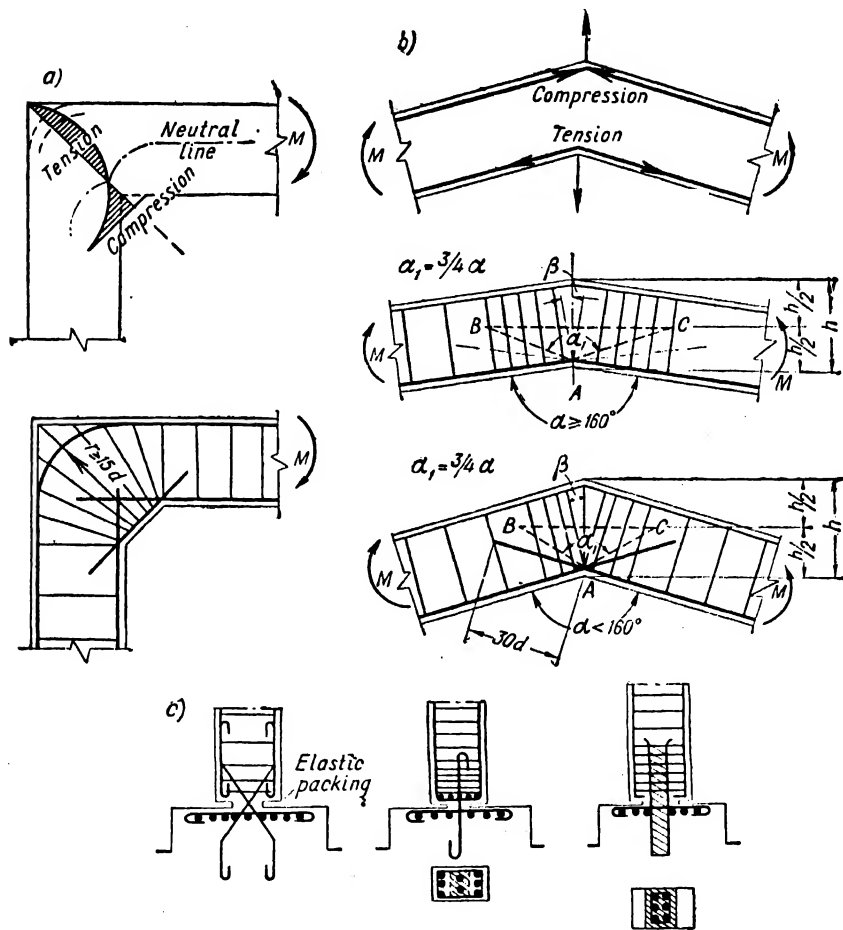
Details of reinforcement of mating angles and hinged column bases
